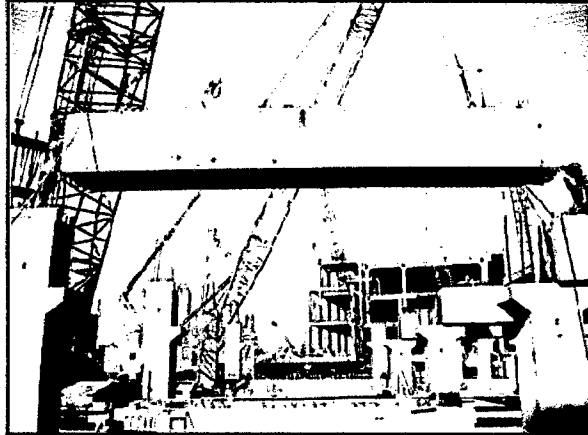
A typical rectangular frame that consists of two (2) precast concrete columns and a precast horizontal beam
